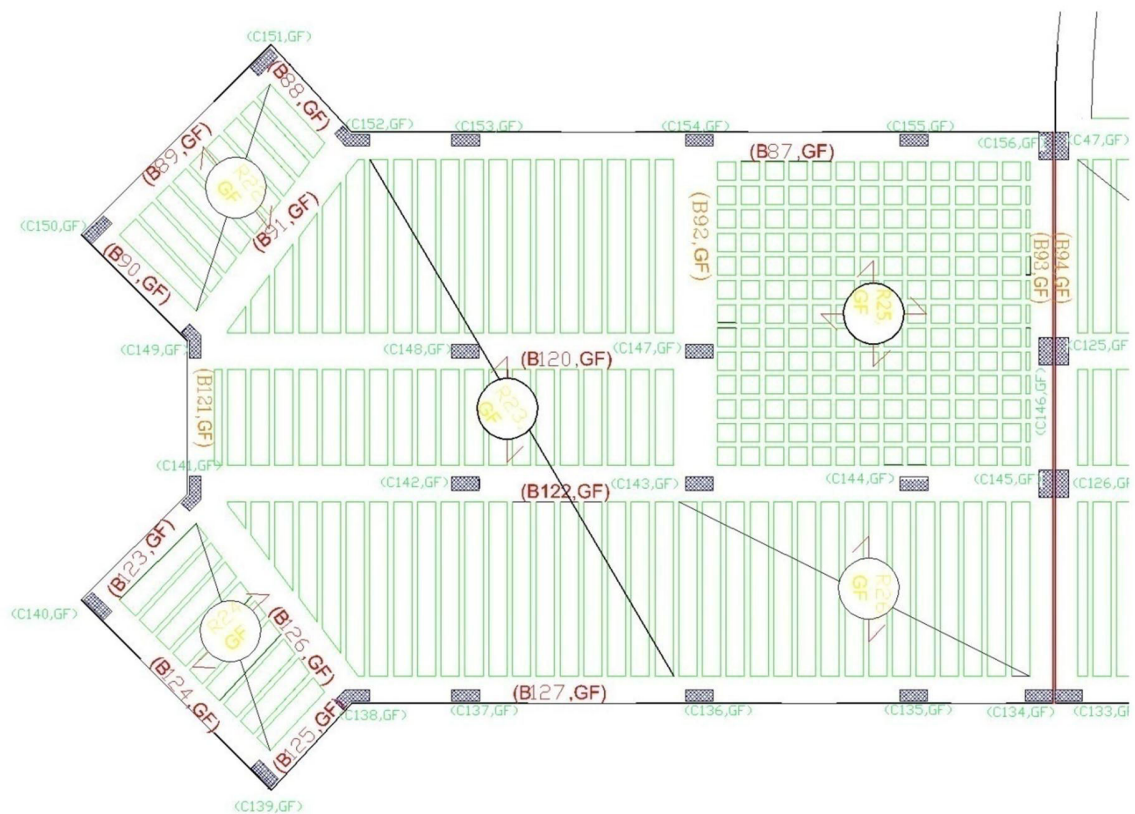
location of Beam (G.F, B122) in slab drawing plan.
